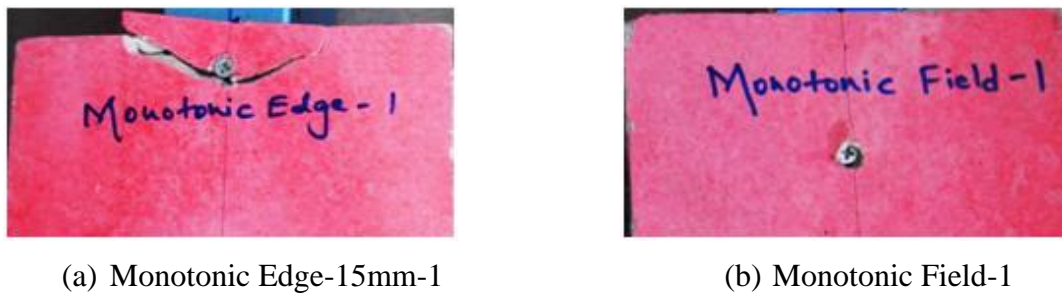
Failure mode of stud-fastener-sheathing connections under monotonic loading
